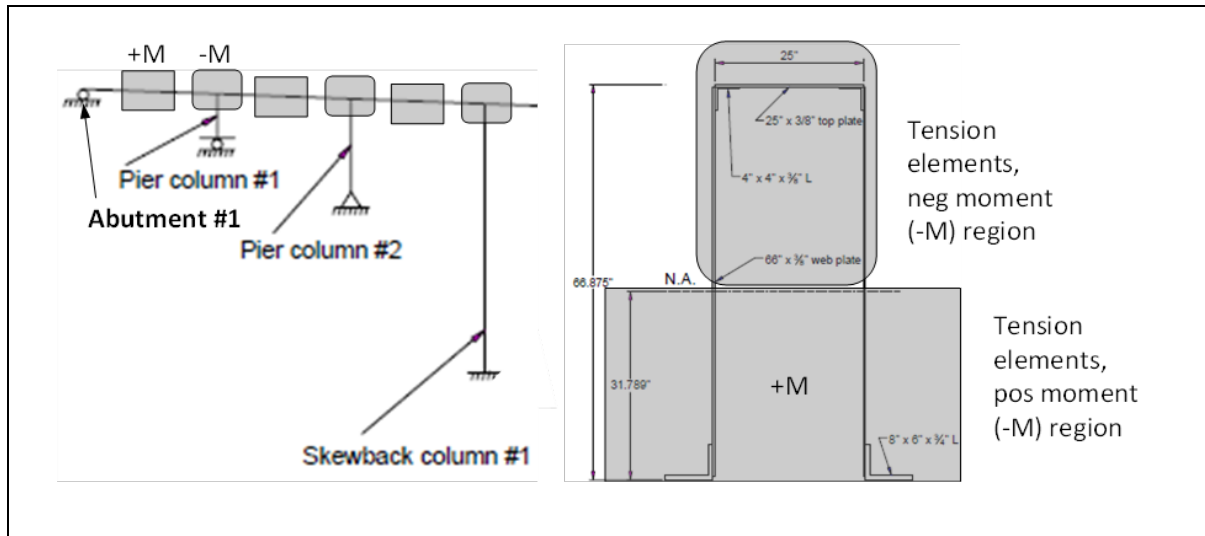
Tension elements of fracture critical members – spandrel girder (span #1-#3).
